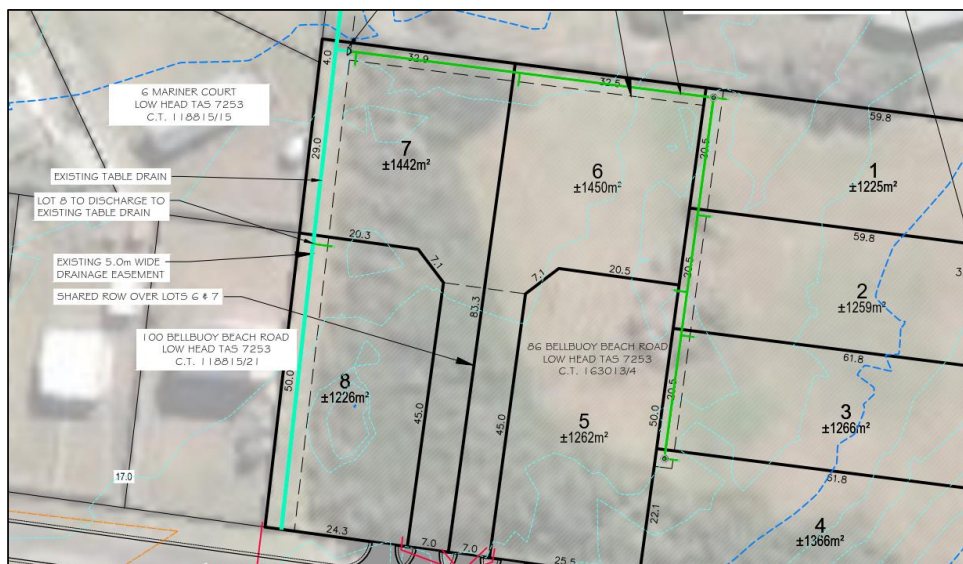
Proposed development drainage system arrangement 24.159-Cp01-RC
